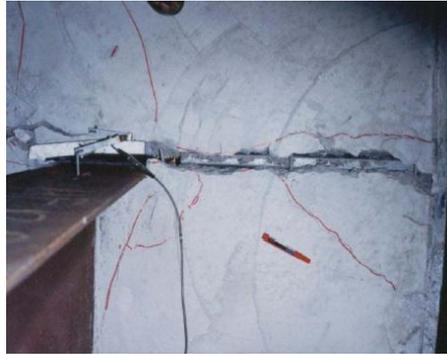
Slab Damage in a Post-Tensioned Beam Subassembly (Clifton, 2005)
